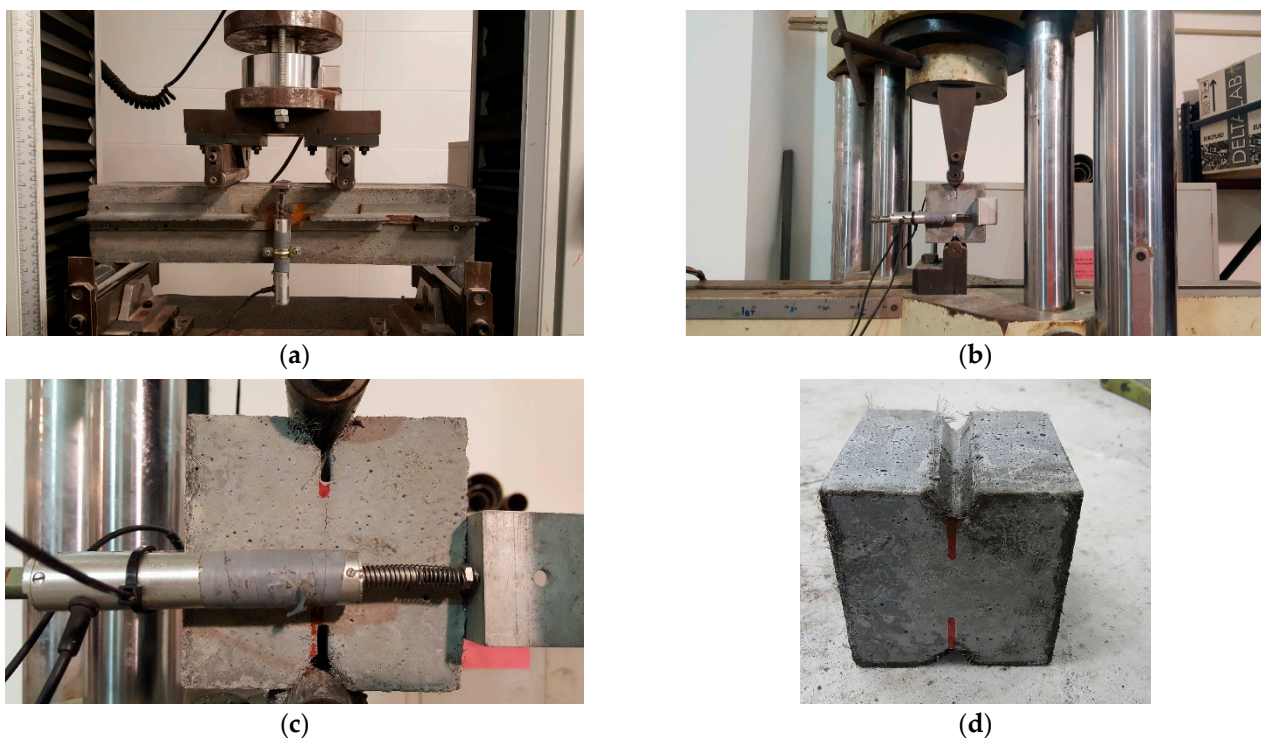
Flexural and splitting test setup: microcrack level in prismatic specimens (a) and macrocrack level on notched cubic specimens (b–d).
